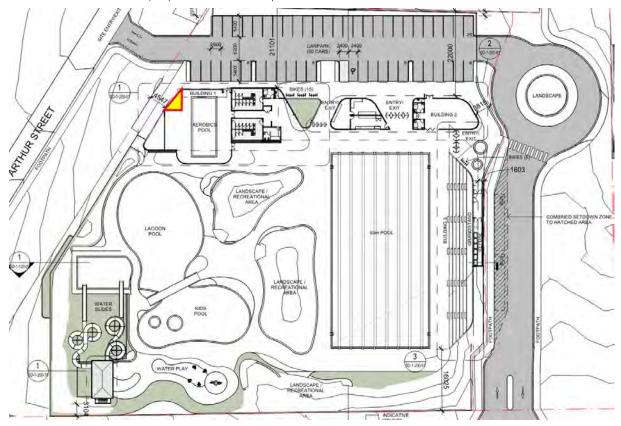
Location of plant (red outline with yellow shading) on the exterior of the indoor aerobic pool building.
